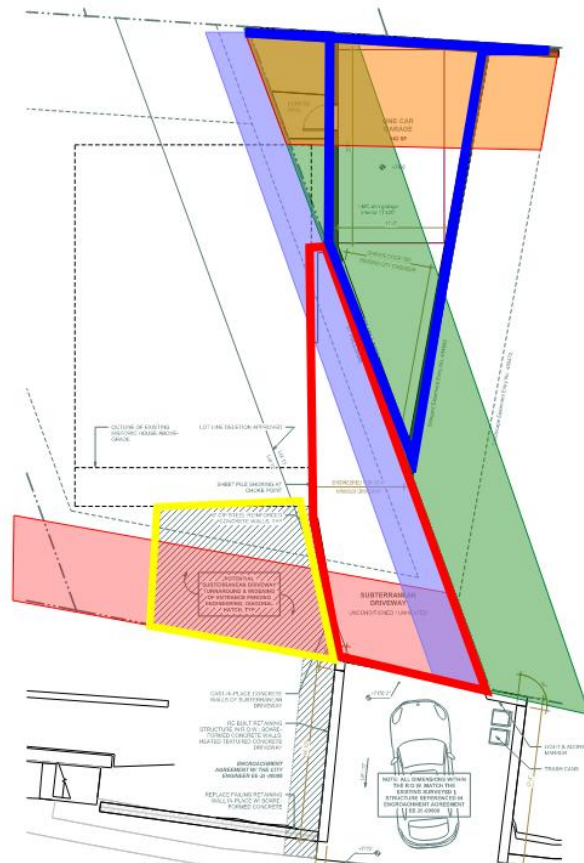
Applicant's proposed Site Plan. The Front Setback at 37 Hillside is shaded red, the Side Setback is shaded blue. The Rear Setback at 45 Hillside is shaded orange, the Side Setback is shaded green. The proposed Structure on 37 Hillside is outlined in red, the proposed Structure at 45 Hillside is outlined in blue. The proposed turnaround is outlined in yellow. Site Plan highlighted by Staff.
